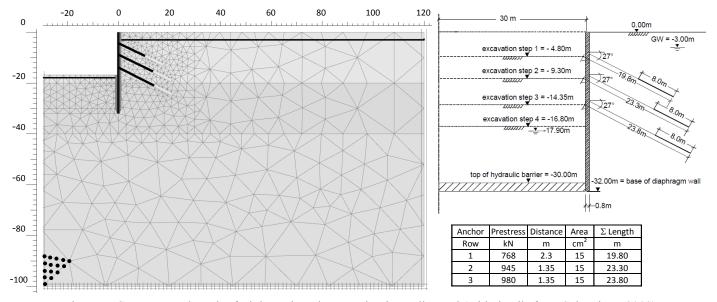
Geometry and mesh of triple anchored excavation in Berlin sand (with details from Schweiger, 2002)
